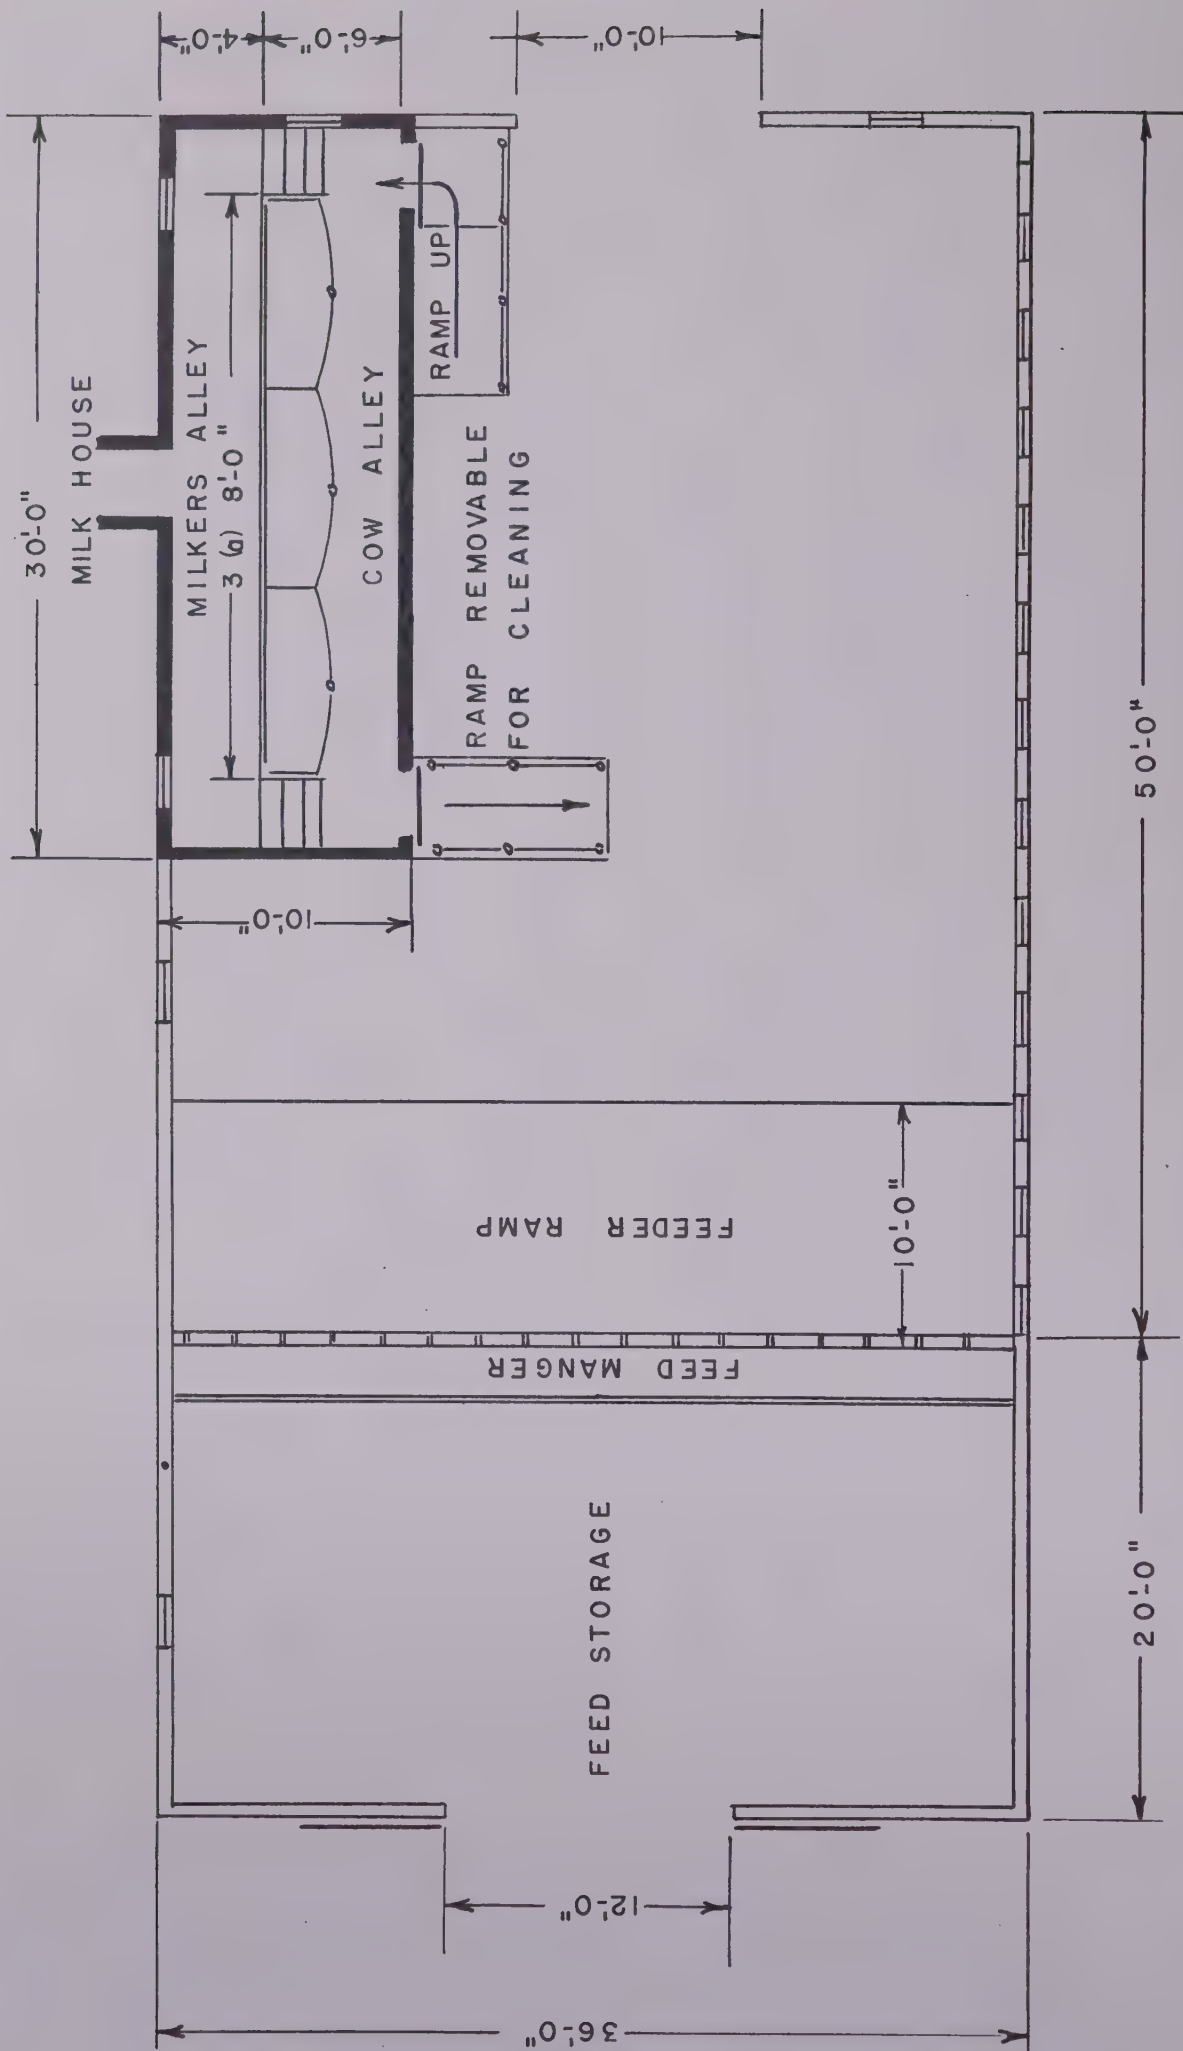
Floor plan of loose-housing barn with feed storage and milking room inside the barn. Floor area sufficient for approximately 18 - 20 cows.
